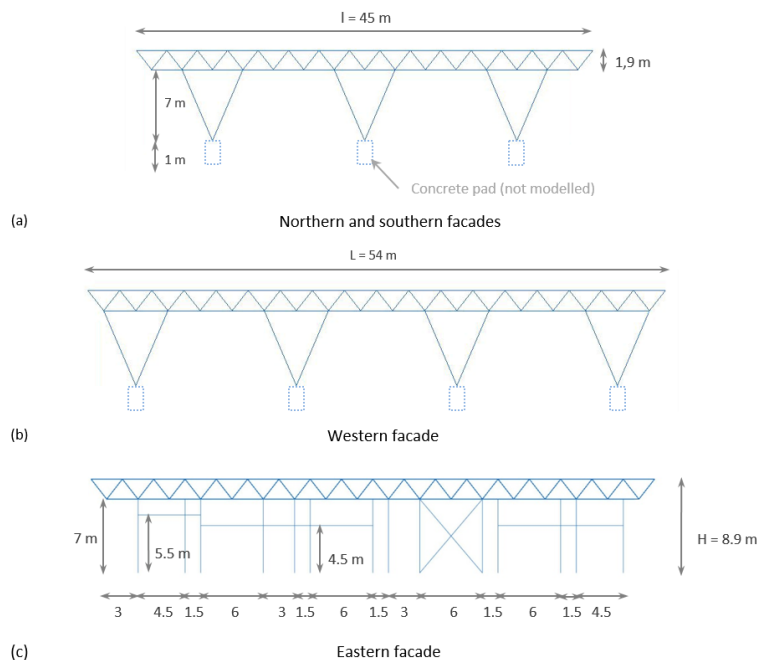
Sketches showing the geometric details (size and shape) of the metal structure of each facade of the Irstea Cévennes building.
